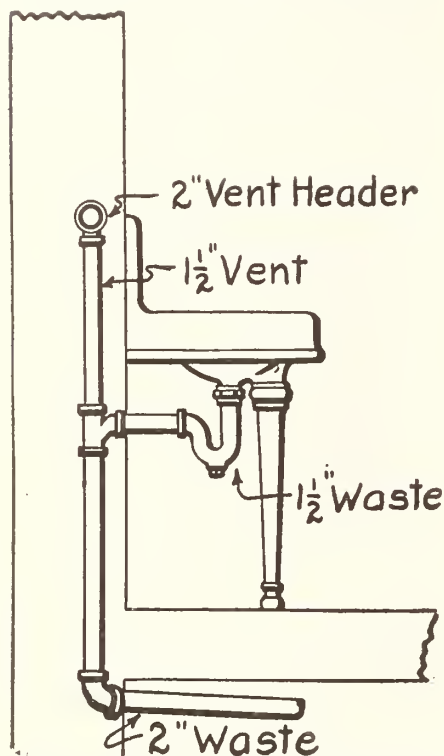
Sectional View of Lavatory and Piping used in the Aeolian Building.
